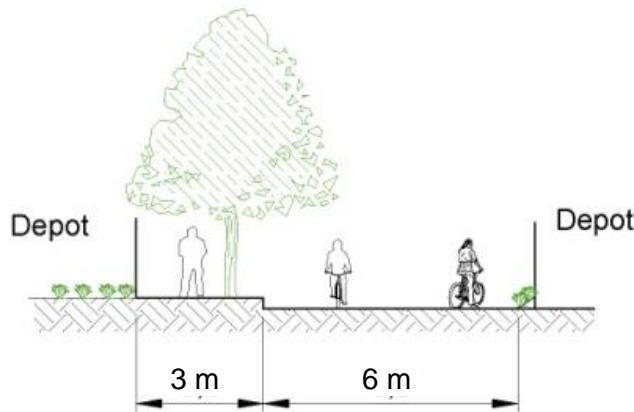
Cross-section of Main Roads in the Area
